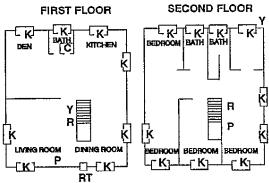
on page 1-2 details typical fire and burglar installation layouts. This can be used as a guide in planning the specific installation.
